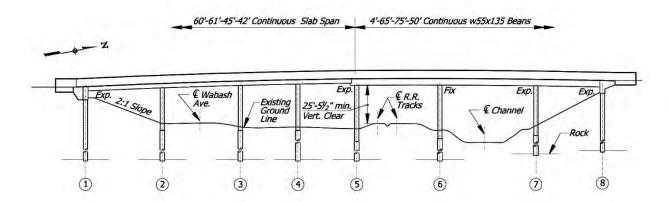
Elevation view for Bridge number 15558X, looking west. (Source: Missouri DOT)
